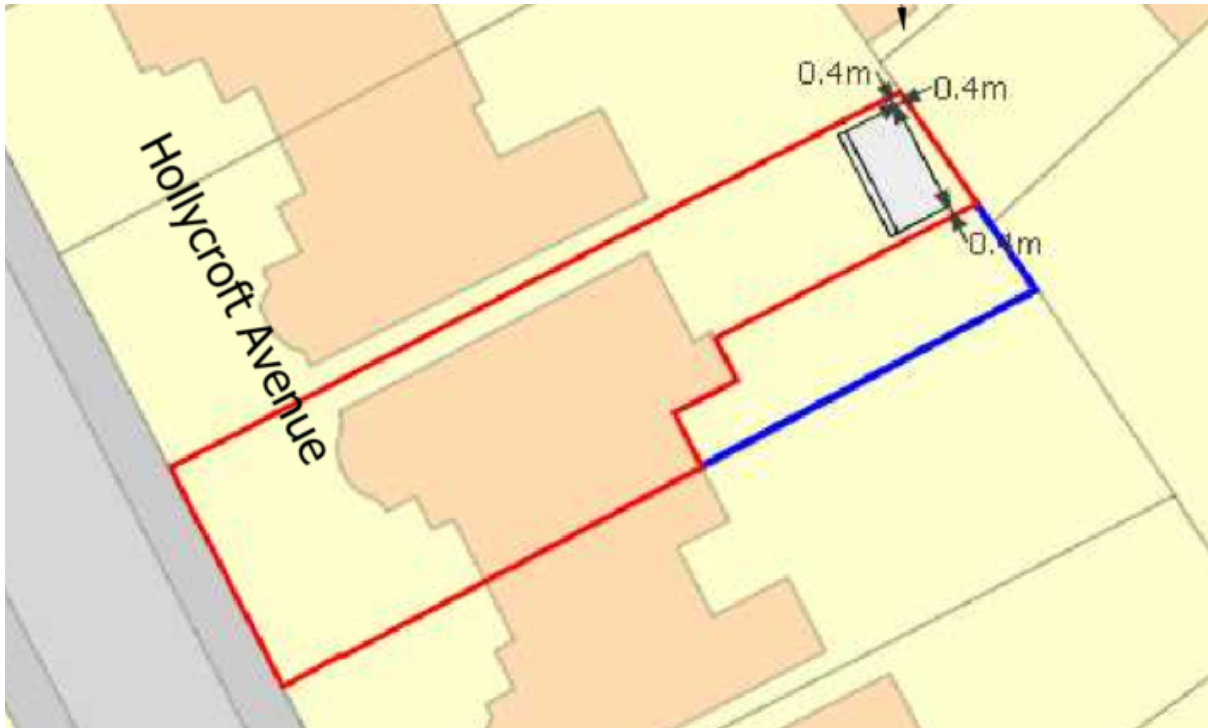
(above): Site Plan showing Proposed Outbuilding on site (source: application drawings)
